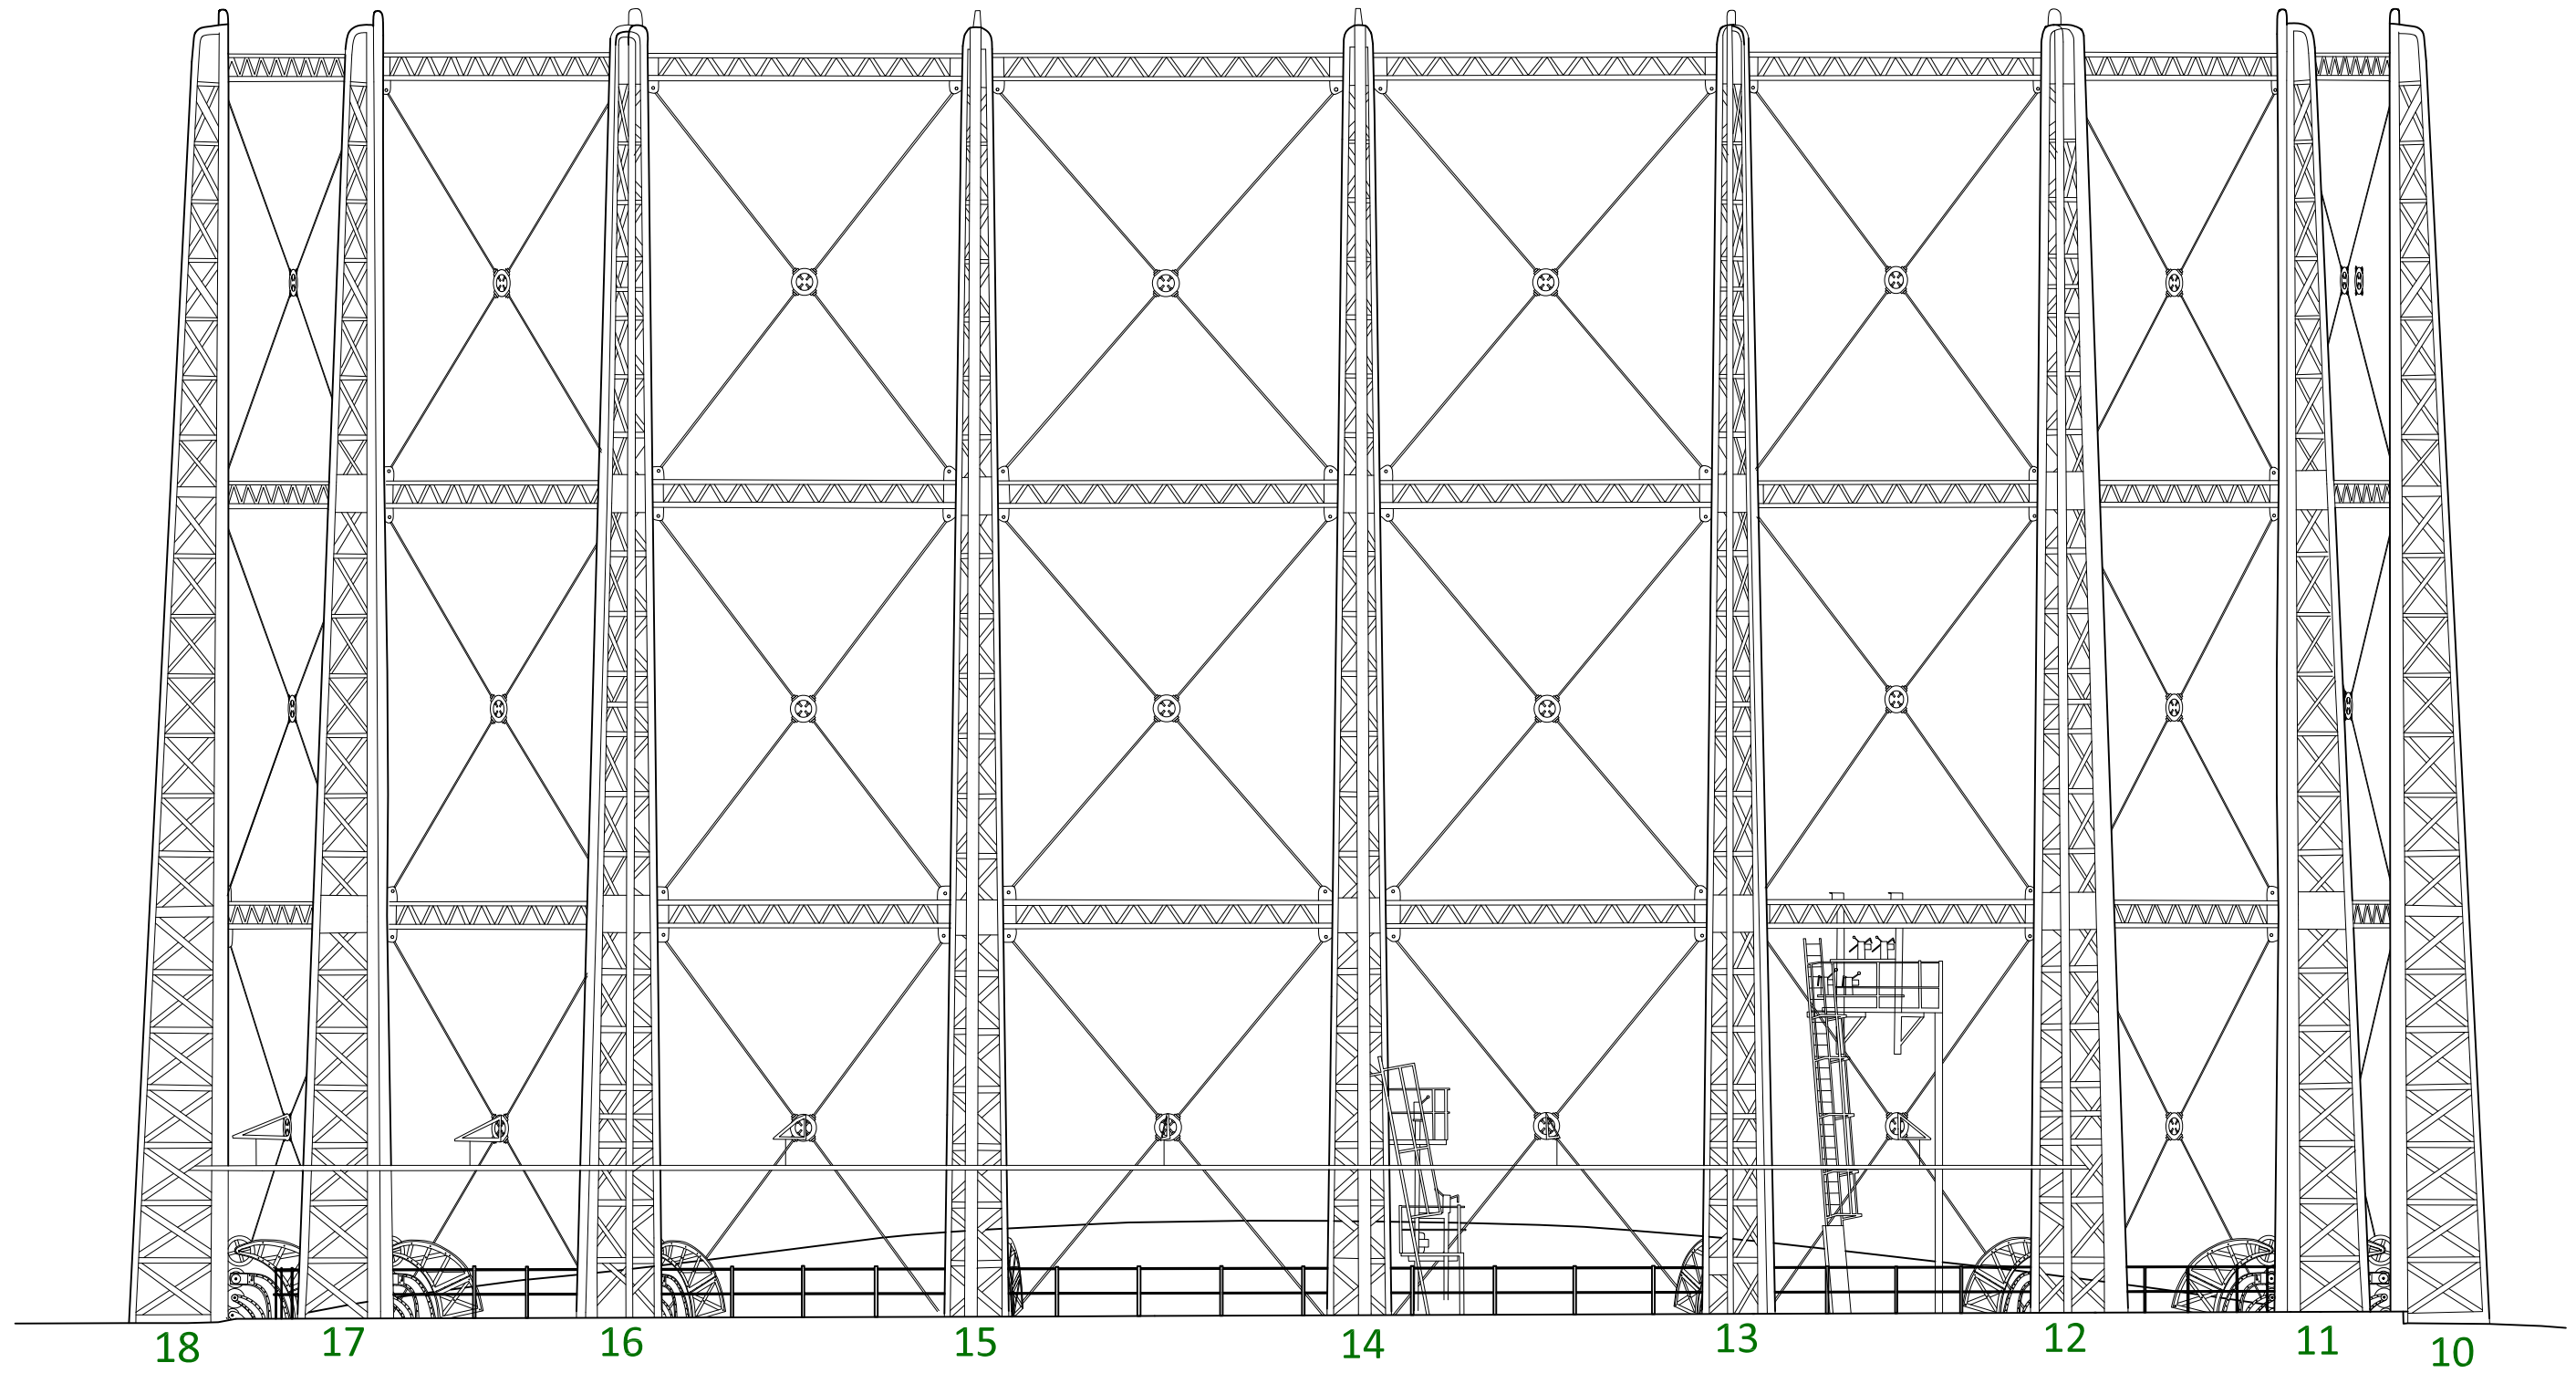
Bell Green, Sydenham, Gasholder No 7, north-facing elevation
